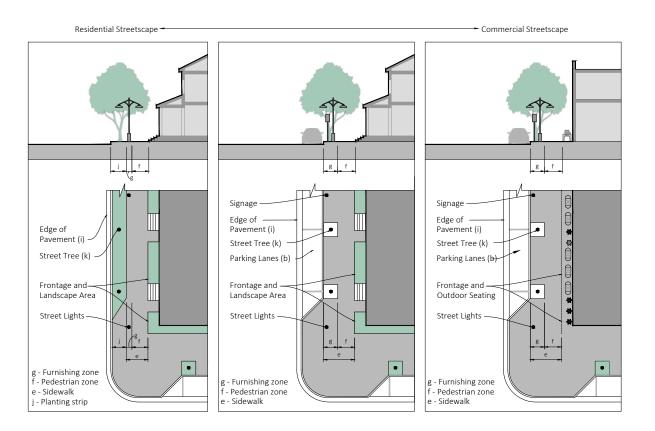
Residential streetscape conditions for townhouses in Delray Beach
